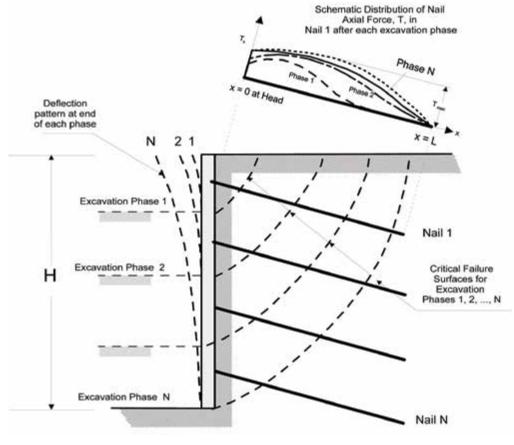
a Potential failure surfaces and soil nail tensile forces (*Lazarte, Elias et al. 2003*) requirements detailed in FHWA Geotechnical Engineering Circular No. 7 (Lazarte, Elias et al. 2003). Several computer programs are available for design of soil nail walls, with the more common programs being SNAIL (CALTRANS 1999) and GoldNail (Golder 1996).
